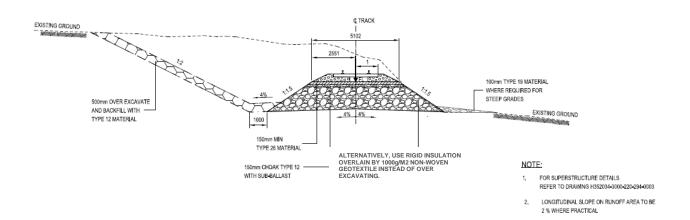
Typical Cross Section Railway Embankment in Soil Cut - Section IV
